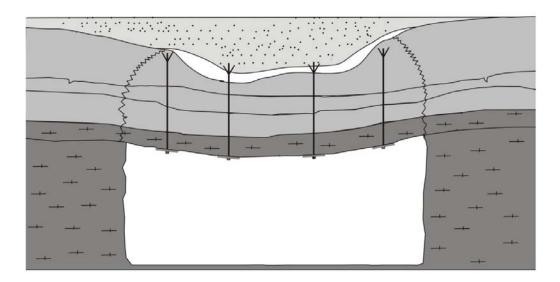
Failure to reach a stable anchorage with roof bolts can result in a roof fall.
